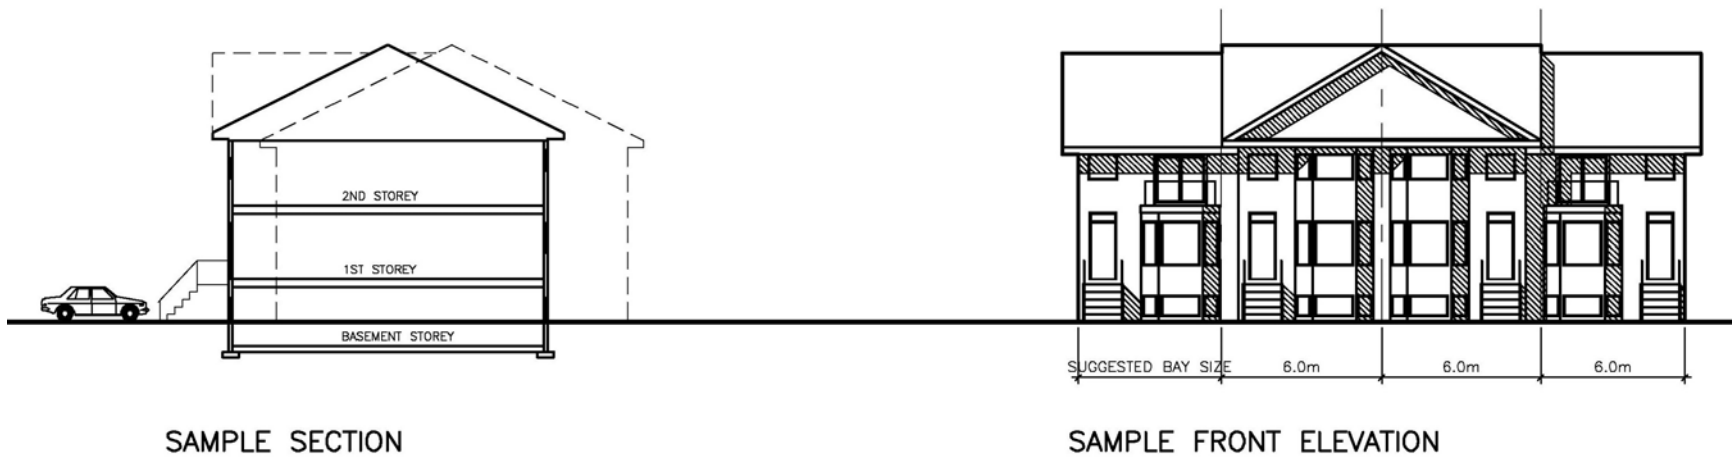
Sample 2 Storey & 2 ½ Storey Townhouse without Garage
